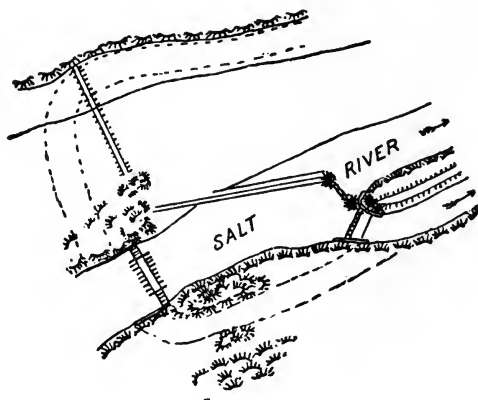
ARIZONA CANAL. PLAN OF HEADWORKS.
